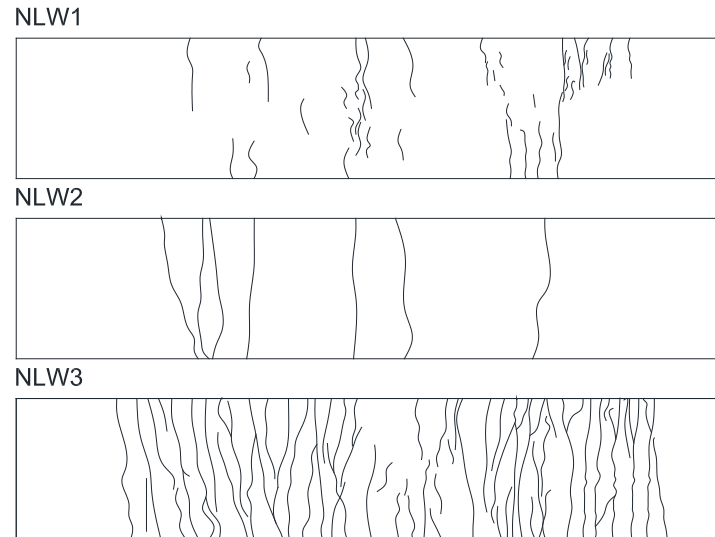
Crack patterns of test specimens (Note: only bottom of the panel as tested is shown)
